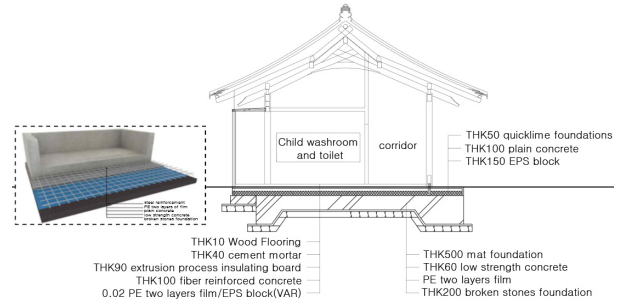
Composite Structure-Converged Reinforced Concrete Foundation
